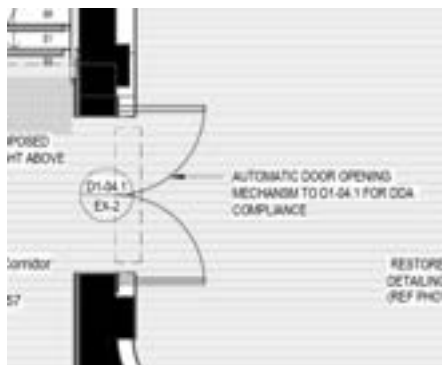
A3-103 Proposed first floor plan showing the automatic opening mechanism to be added to the original doors at the main hall R.1-04. Source: Trethowan Architecture, 2025.
